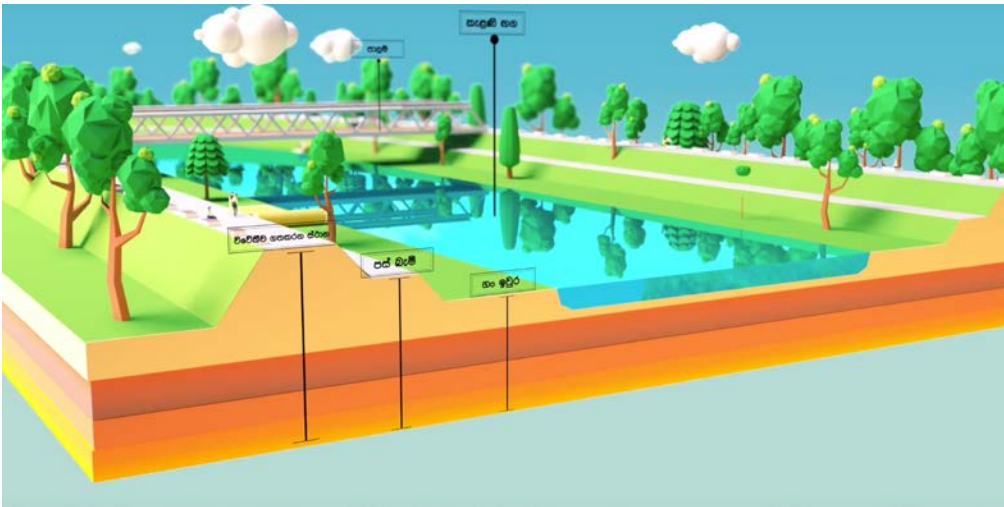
Proposed Cross Section of Flood Mitigation Wall
